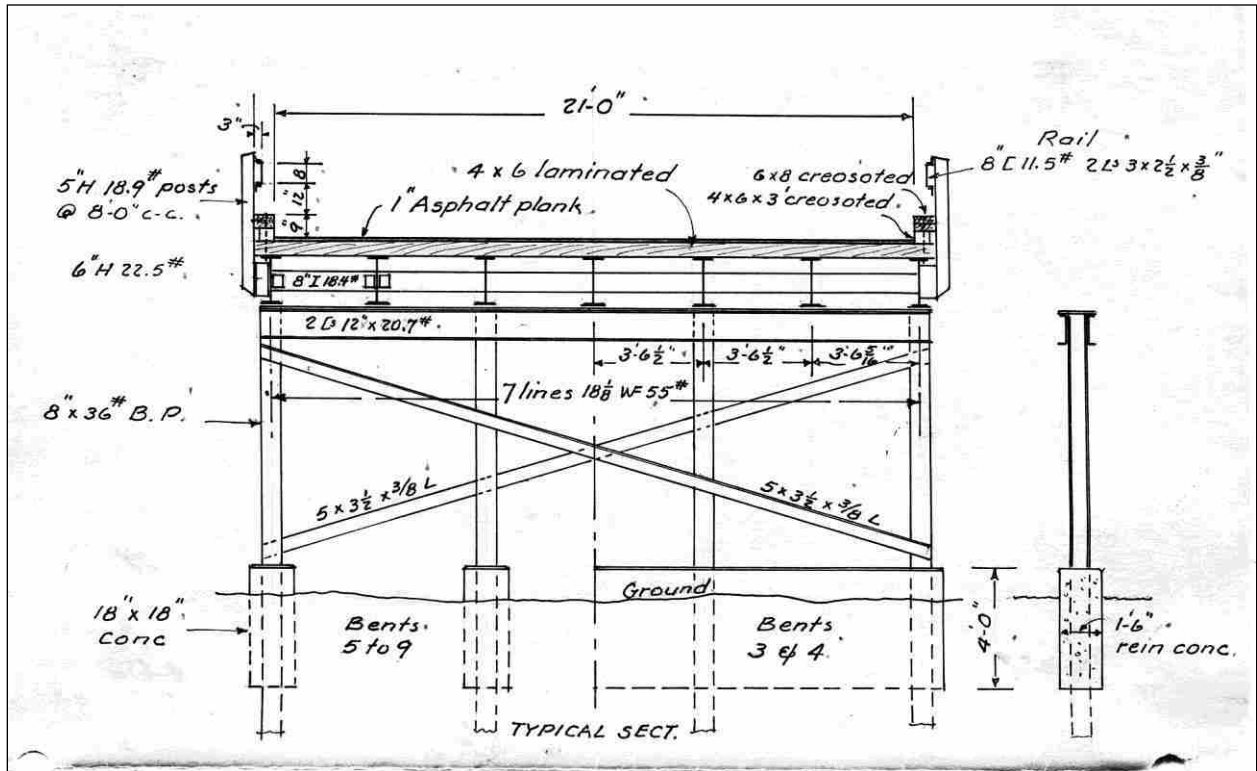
Sewall's Falls Bridge, plan, section through south approach trestle built 1937. Field inspection sketch made by NHHD engineer Wendell H. Piper, May 15, 1942 (NHHD Bridge Inventory Card, Concord 070/117).
